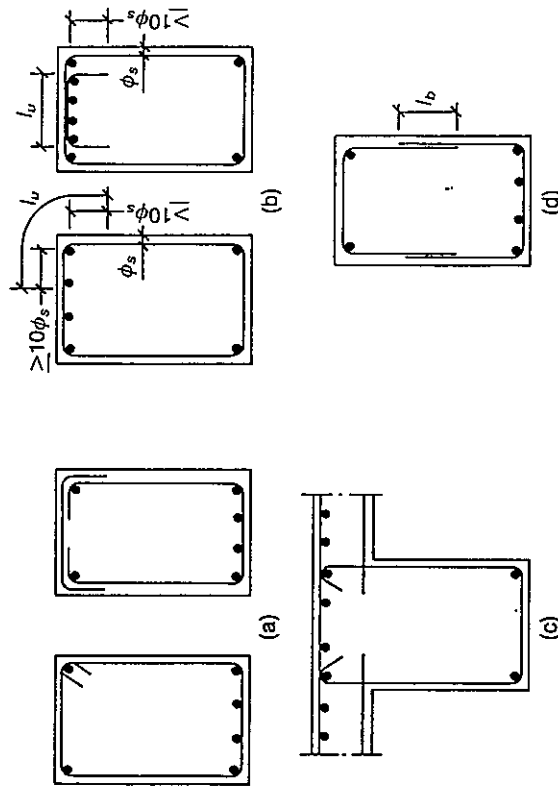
Possible layout of stirrups: (a) closing in compression zone; (b) closing in tensile zone; (c) closing in compression zone; (d) this detail has been used but does require particularly good workmanship to achieve its design purpose
